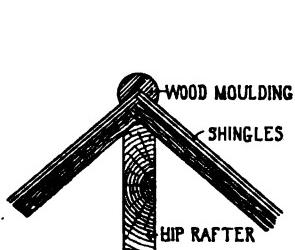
Wooden Hip-Roll for Shingled Roof.
